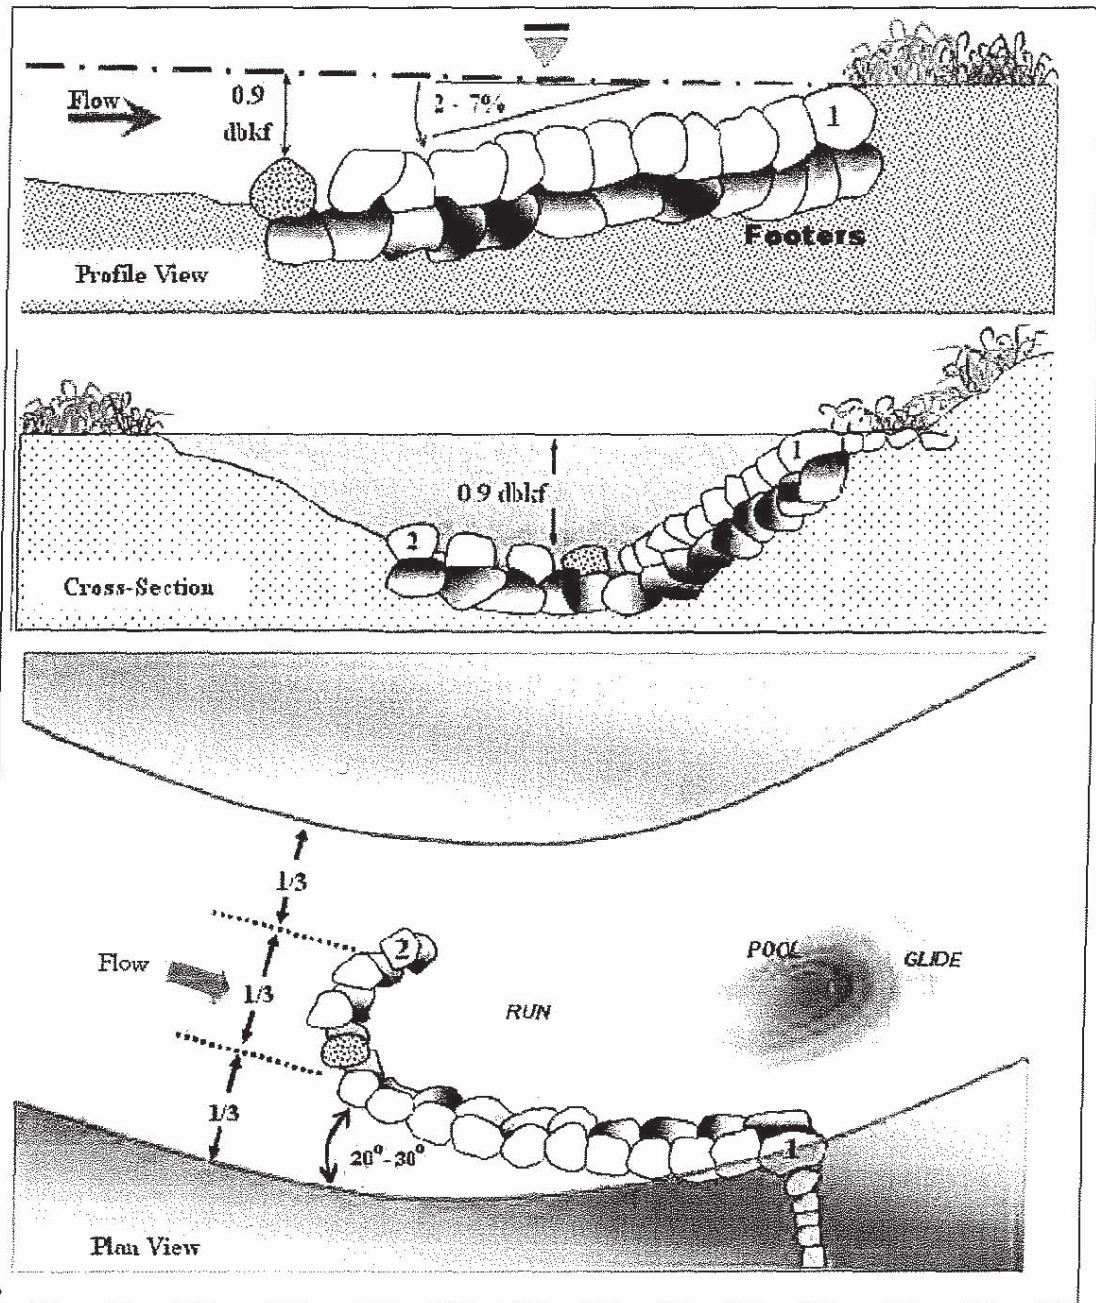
Profile, Cross-section and Plan View of a J-Hook vane structure (NRCS, 2007).
